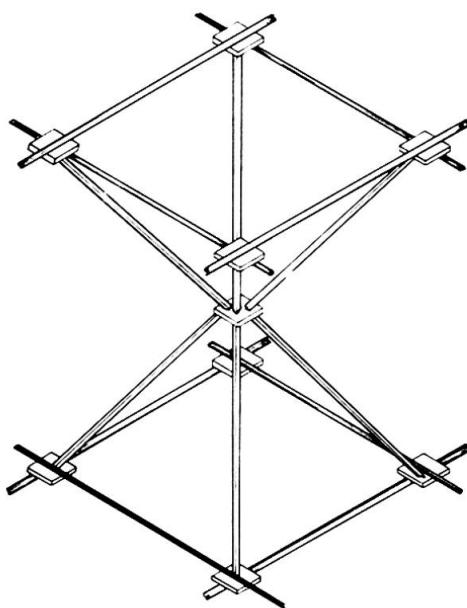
Basic Modular Element of a Rural Spatiostructural Bridge (Sketch)
